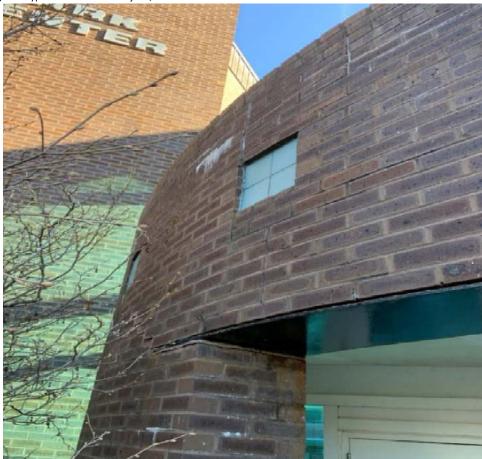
Typical cracks in brick façade, with efflorescence.
